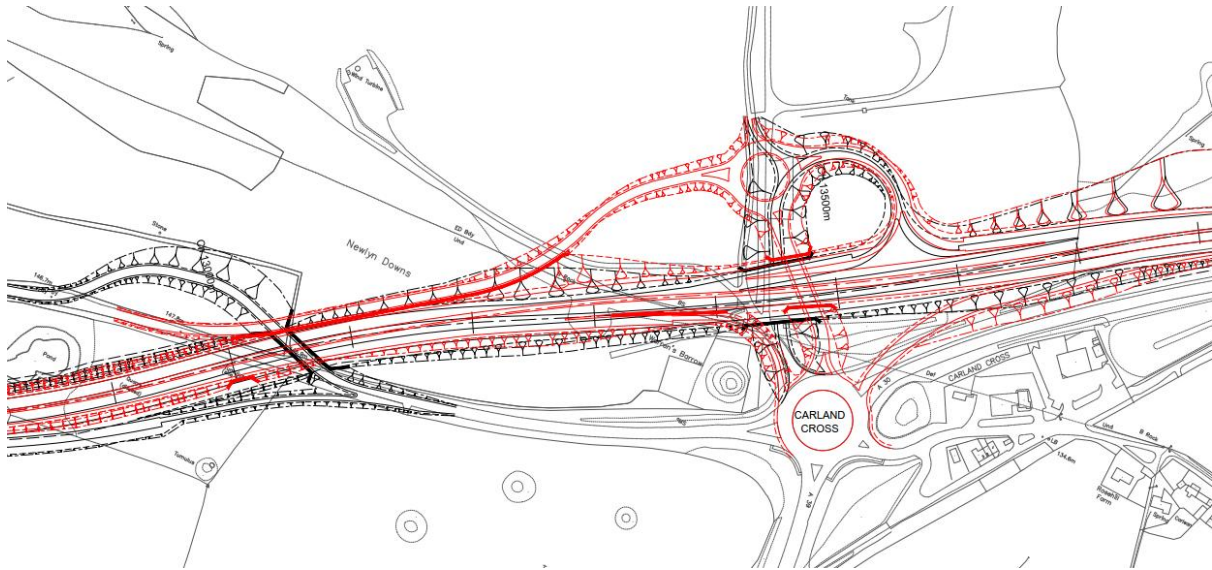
Red shows alternative side road and junction arrangement at Carland Cross
